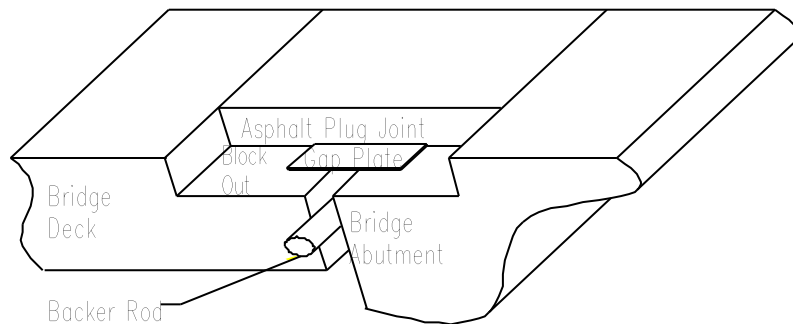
Typical Asphalt Plug Joint Cross Section
